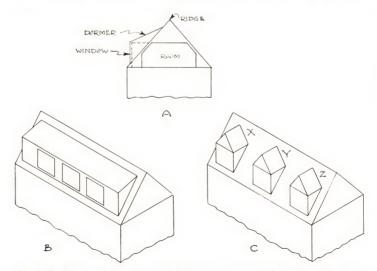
Dormers. A, Attic Room; B, Continuous Dormer; C, Individual Dormers
